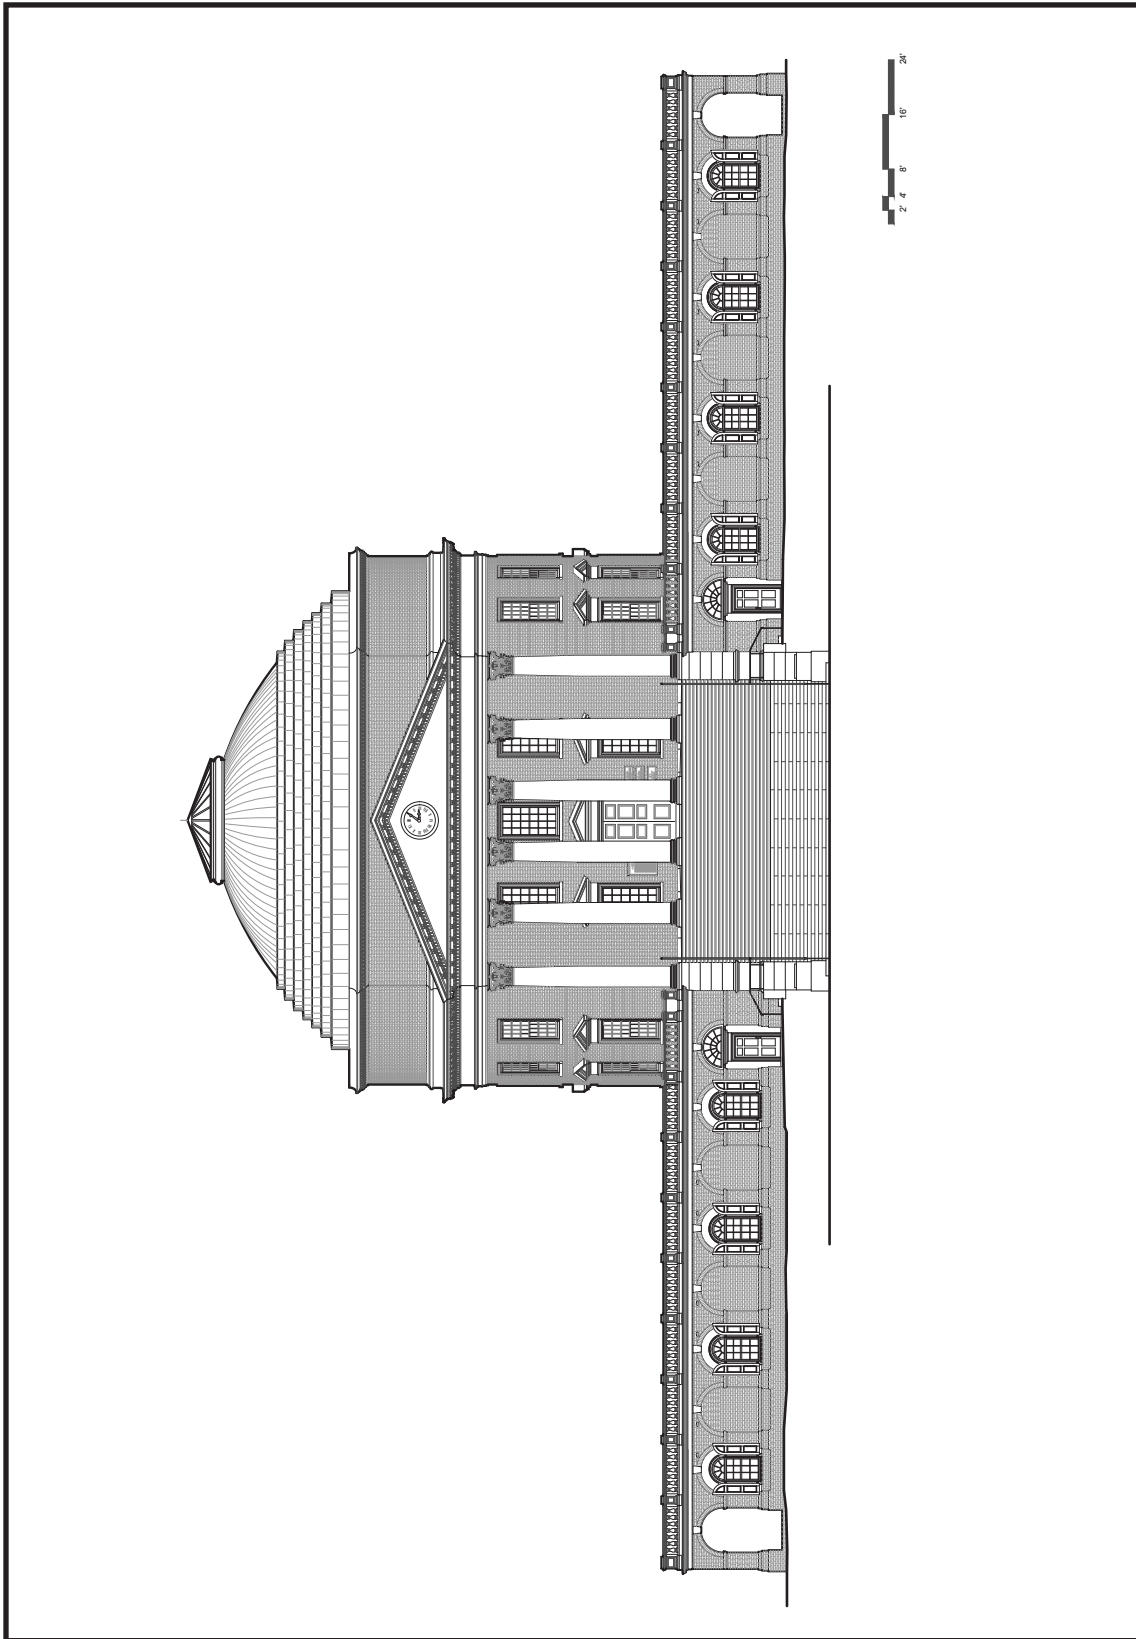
North elevation. Drawing by John G. Waite Associates, Architects, 2022.
